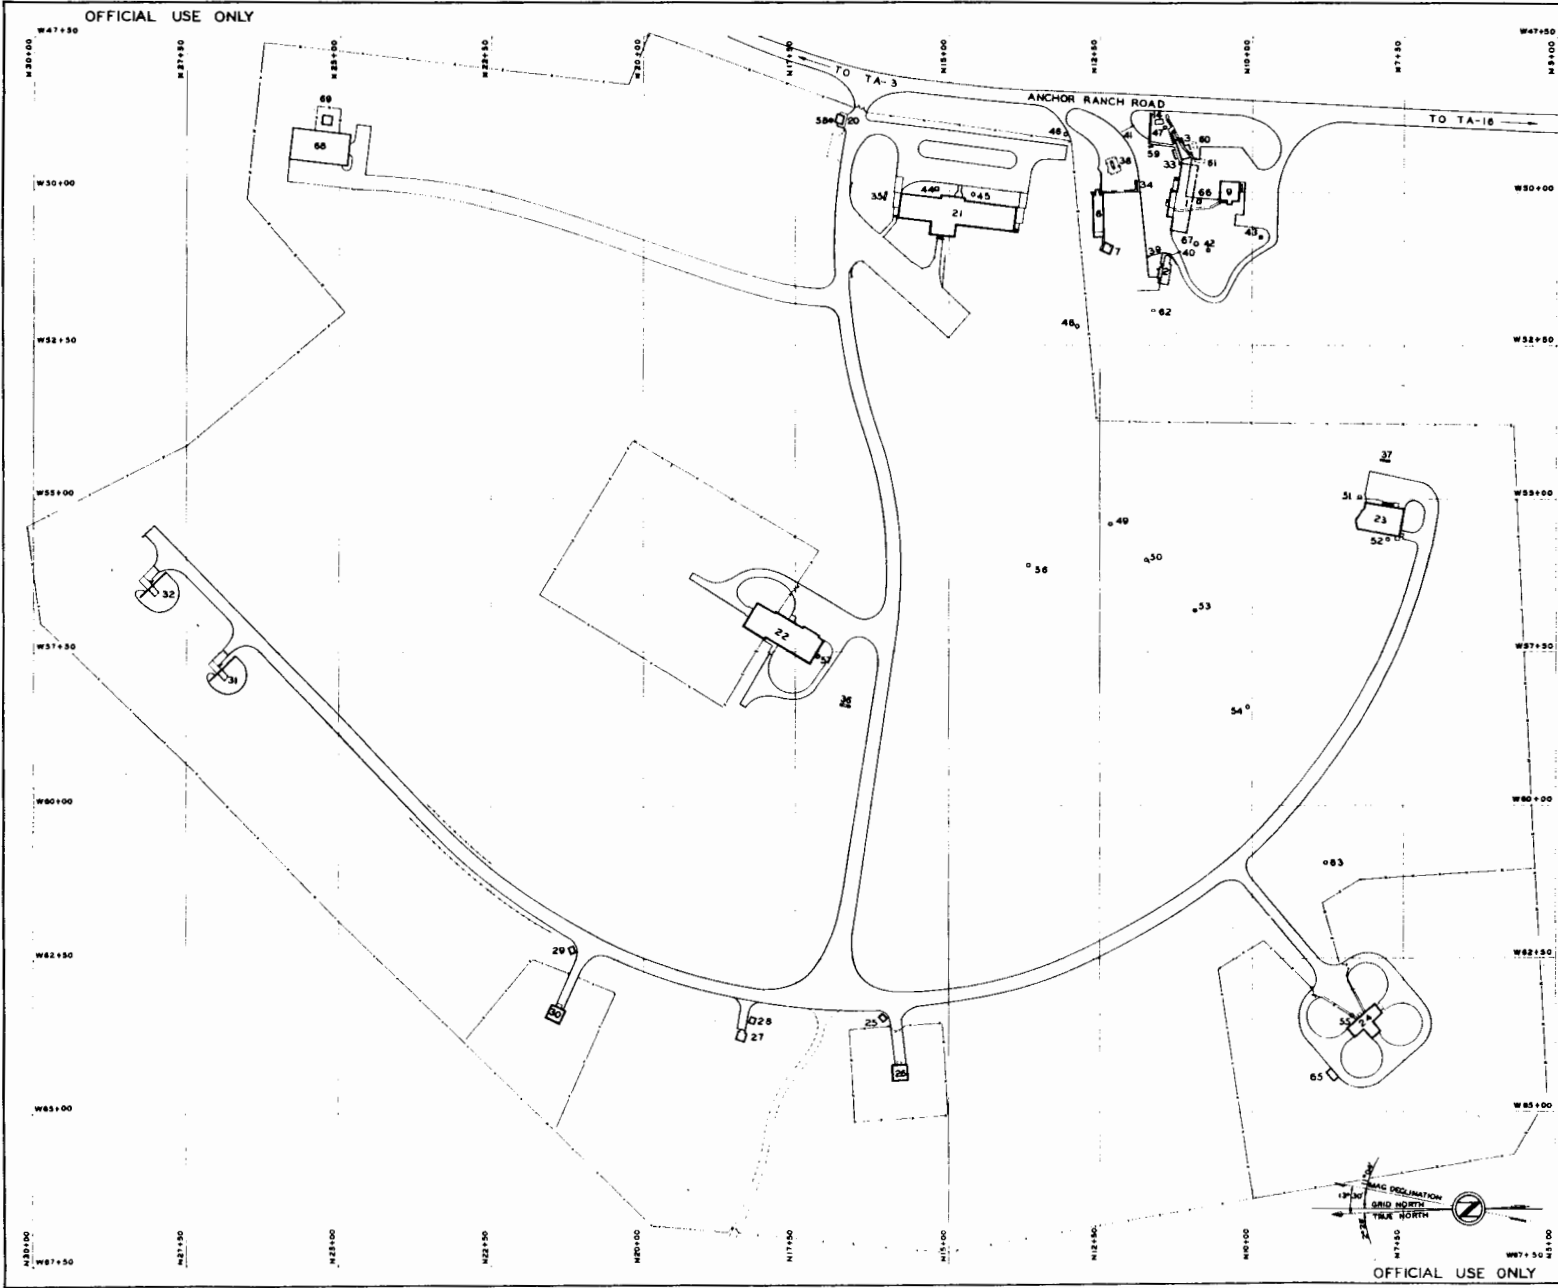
Structure Location Plan for TA-8 - Anchor Site West (1961 Drawing from the LANL Technical Area Structure Location Plans)
